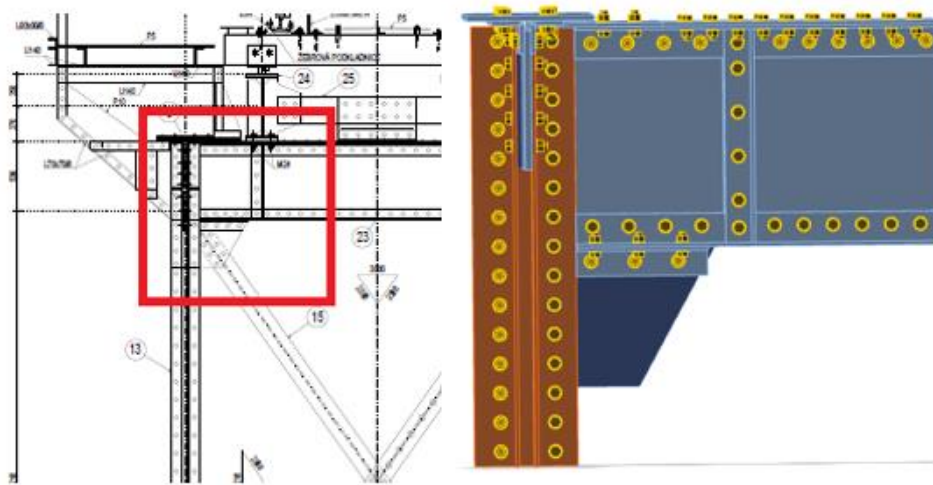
Joint of interest on TU 2362. Upper section of the truss on the supports. Ref. [16]
